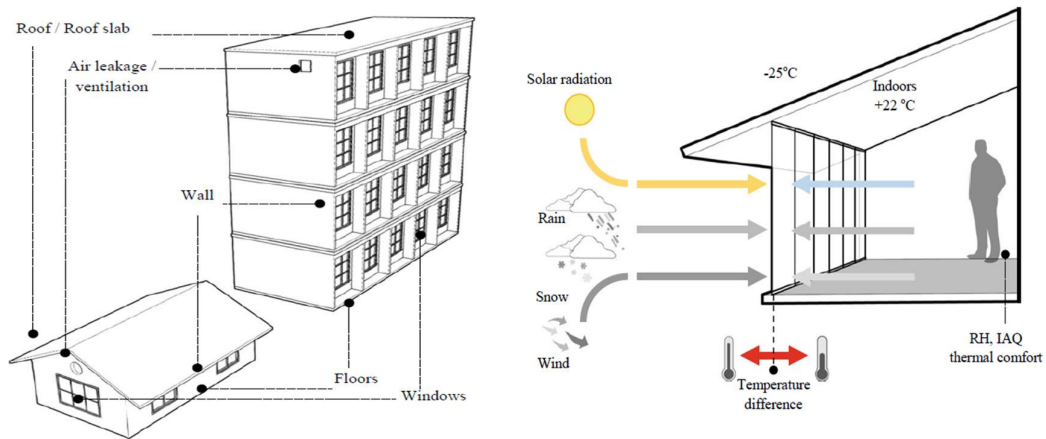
(left): Schematic overview of typical building enclosure components. Fig. (right): Building enclosure as divider between indoor and outdoor environments. (source: Hachem-Vermette, 2020)
